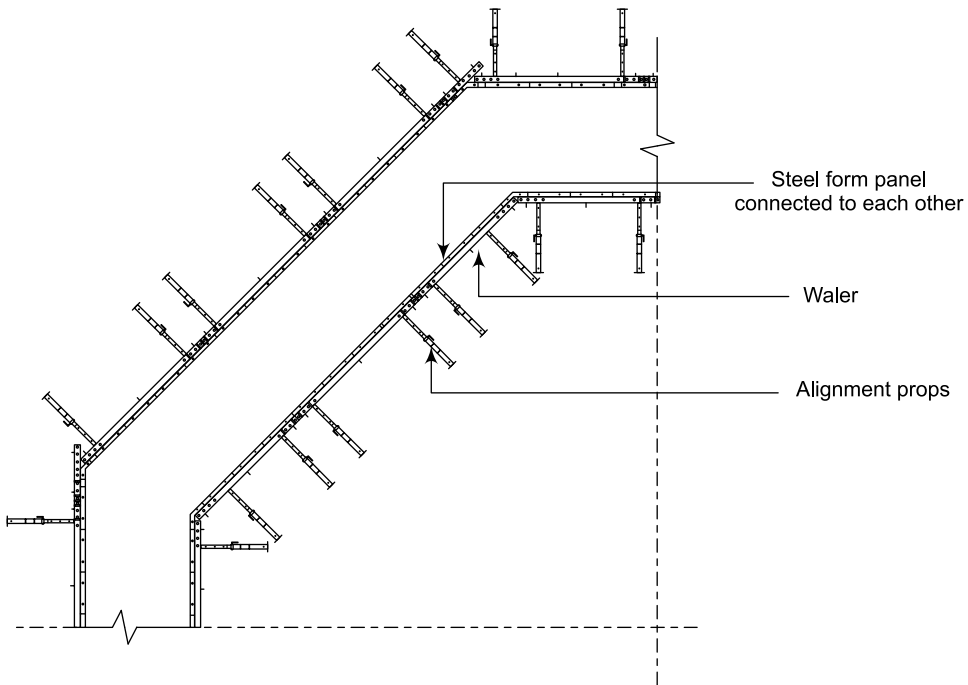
Part Plan of Formwork Arrangement for Octagonal Pier.
